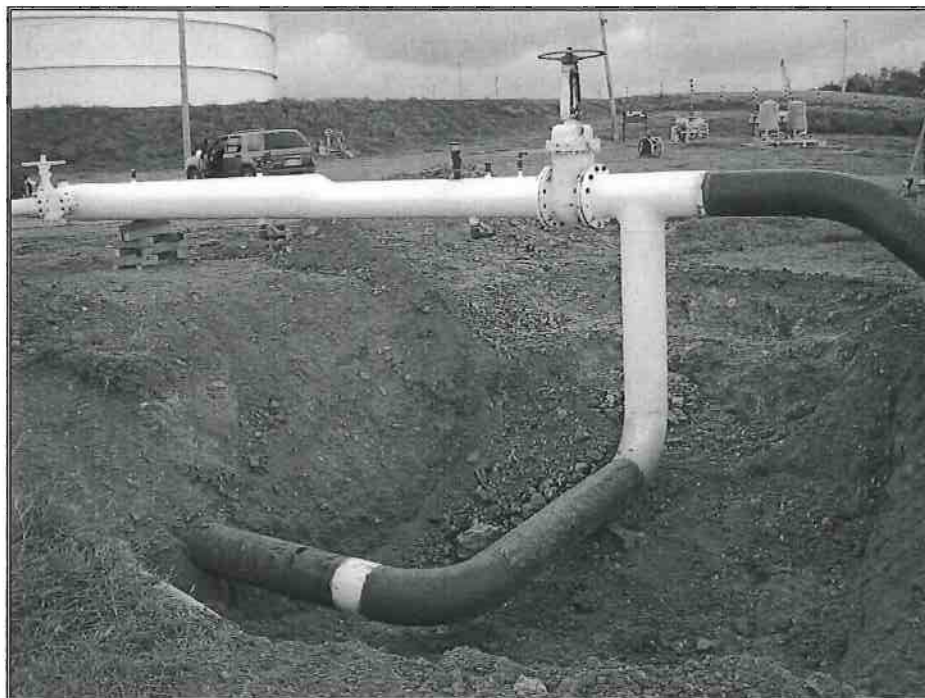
C – VP 9 Pig Trap Installation JP-5 Pipeline
